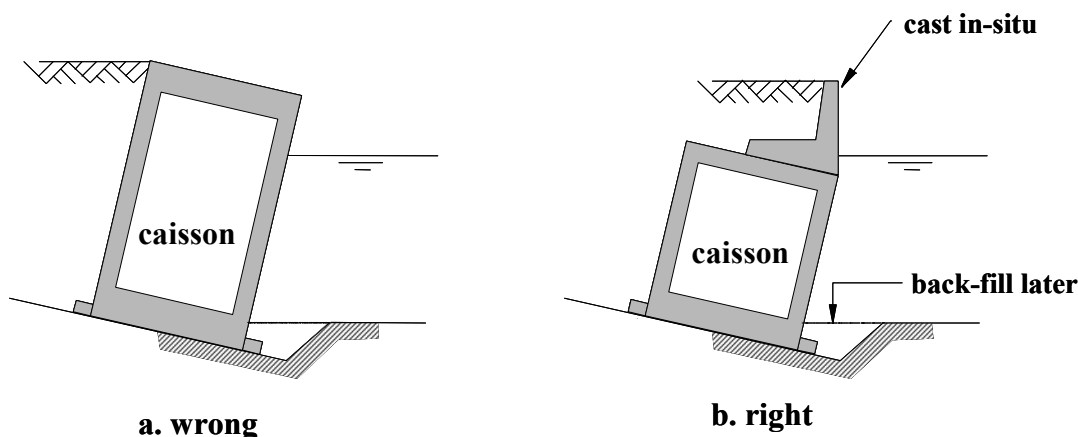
construction error in the positioning of a quay wall-caisson (exaggerated)
